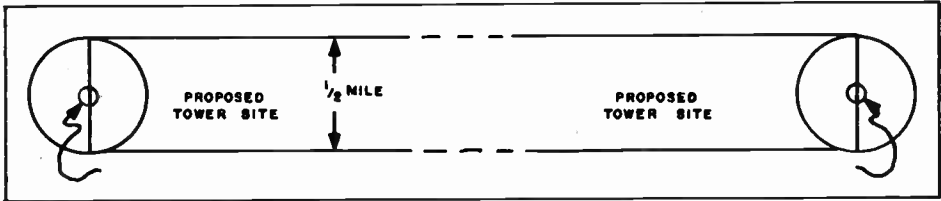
Method of Laying Out the Proposed Tower Site Areas
